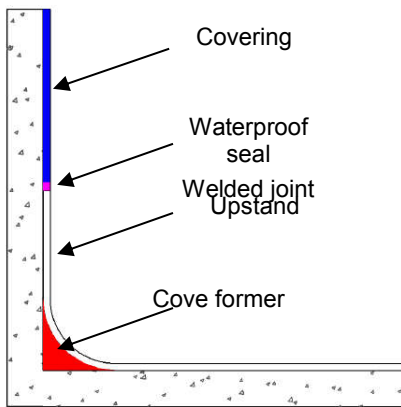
PVC flooring upstand: direct weld/joint
